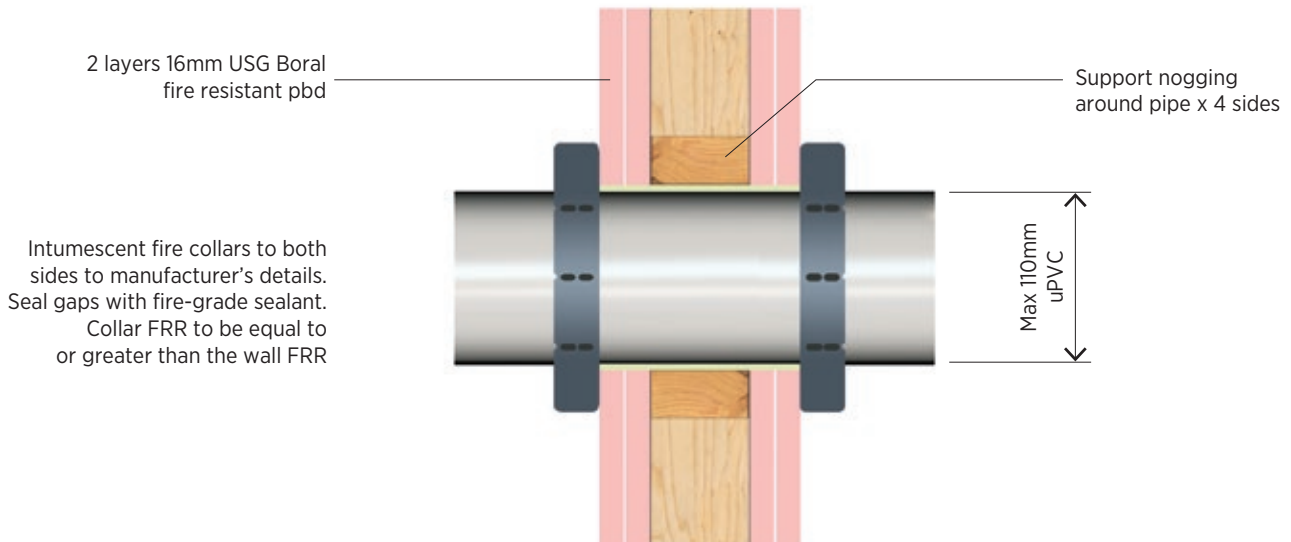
Standard Timber Stud Wall – Pipe Penetration Detail
